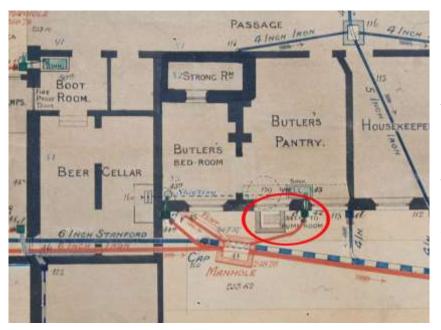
1886 Architects Plan, with the access to the pump room, from the garden, circled. This is labelled 'Steps to Pump Room'.
